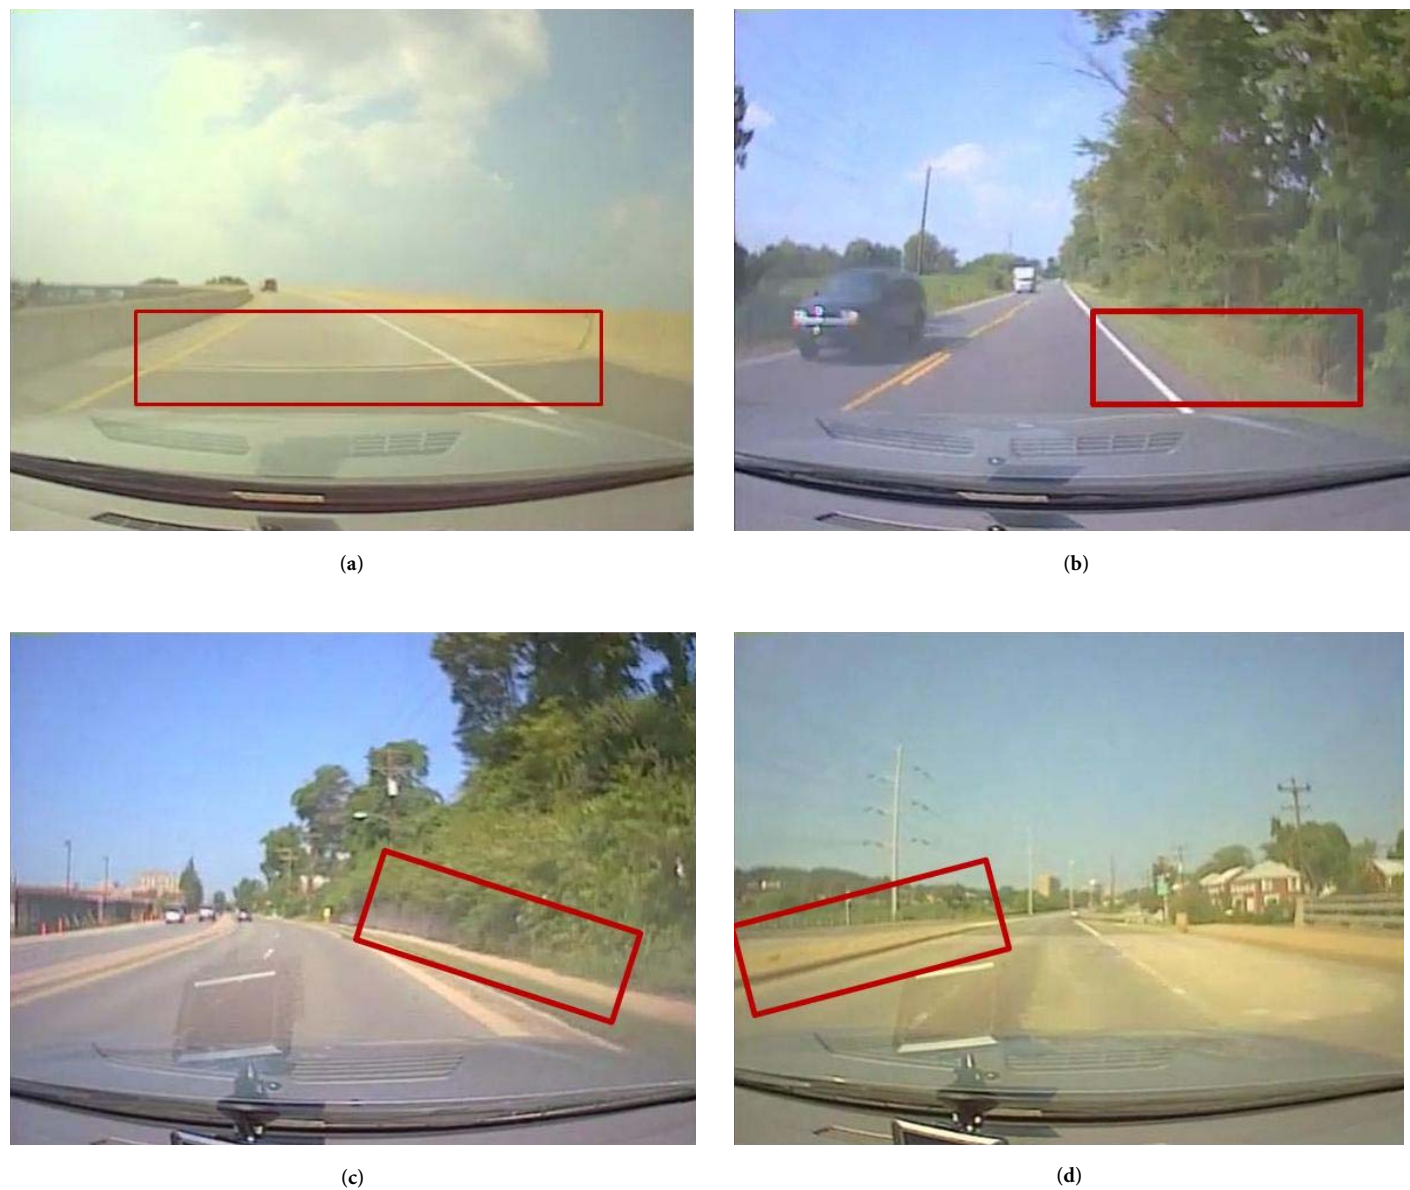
Identification of cross-section elements: (a) illustrates change from asphalt to concrete (surface type); (b) paved/earth shoulder; (c) sidewalk along roadway; and (d) raised median.
